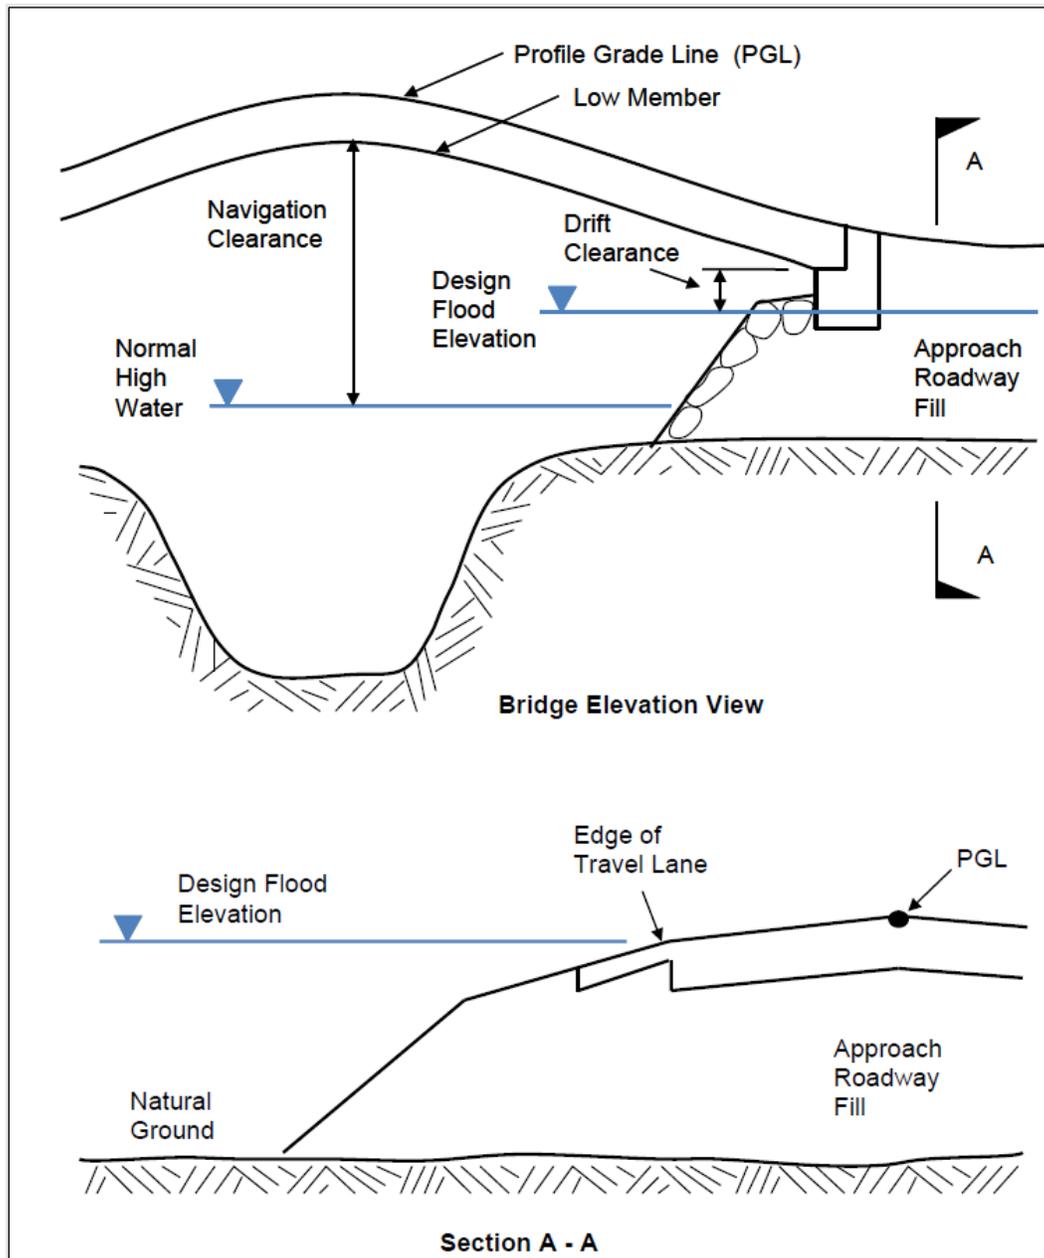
Bridge and Cross Drain Roadway Grade Controls
